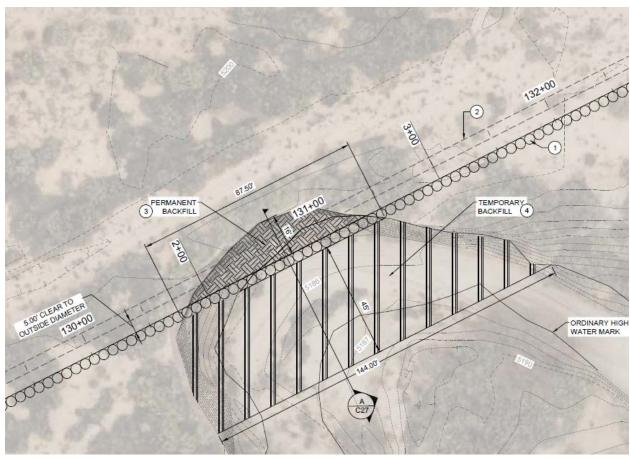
Concrete pile tangent wall design exhibit indicating the permanent and temporary backfill locations.
